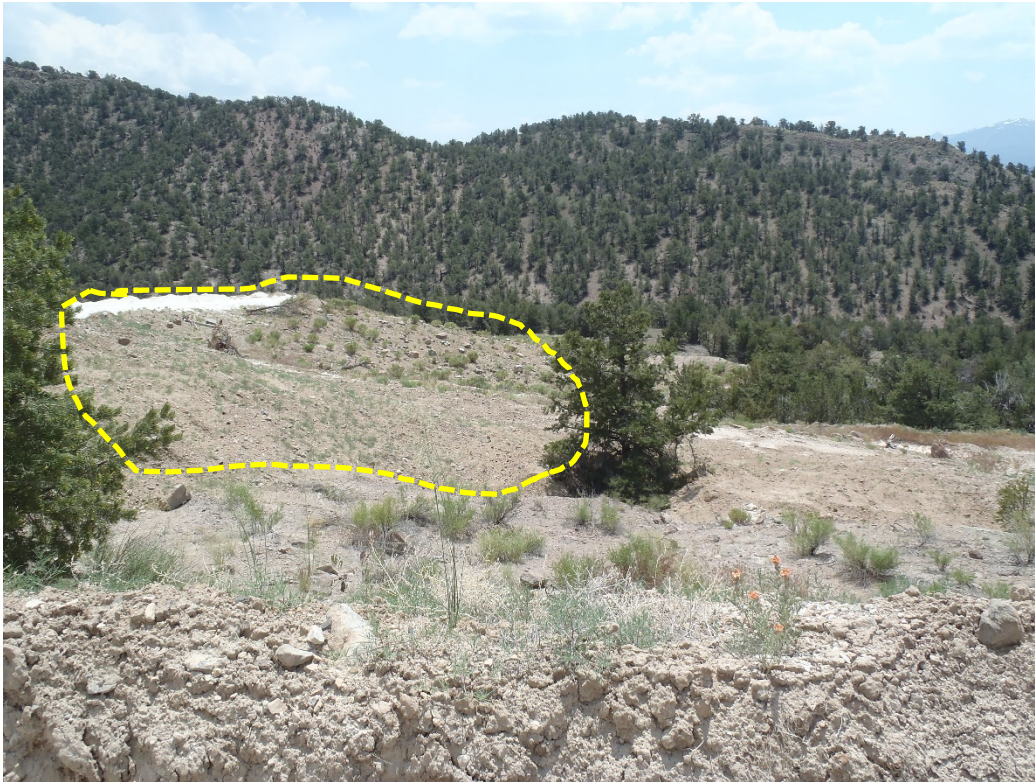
Reclaimed SW side of stockpile area (looking SE from access road).
